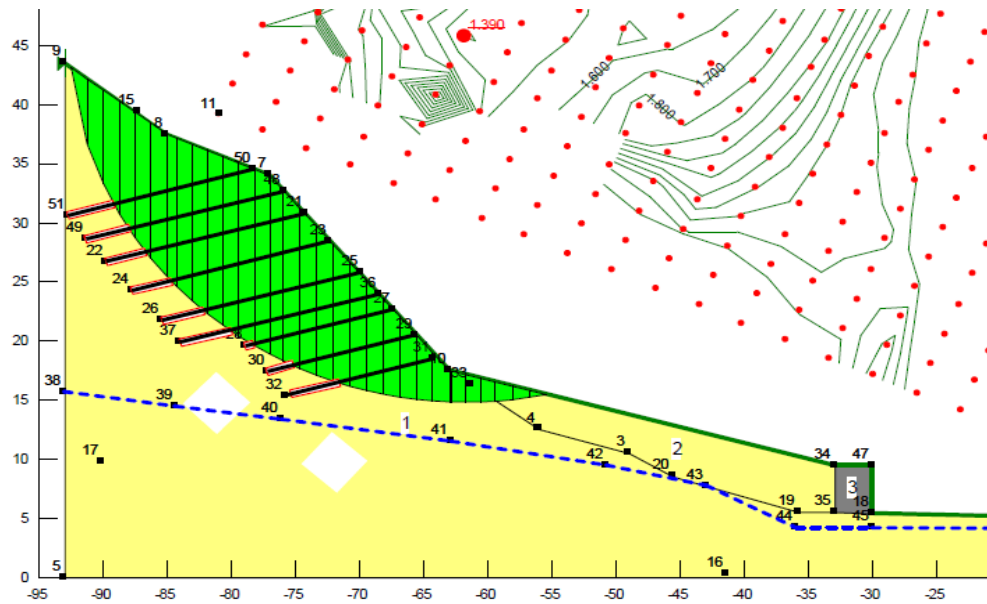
Proposed stabilization with soil nailing subsurface drainage and toe wall
